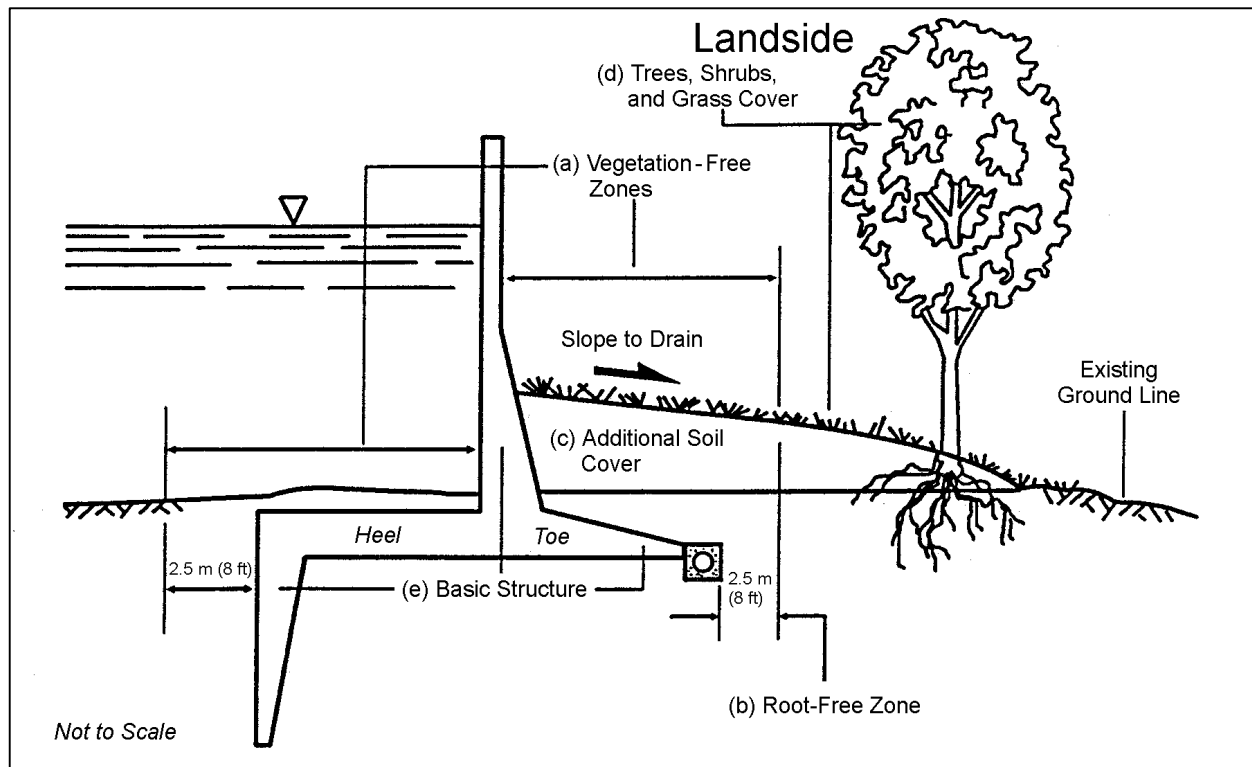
Inverted T-type floodwall showing (a) vegetation-free zone, (b) root-free zone (vertical joint occurring at section), (c) additional soil cover, (d) landscape planting of trees, shrubs, and grass, and (e) basic structure
